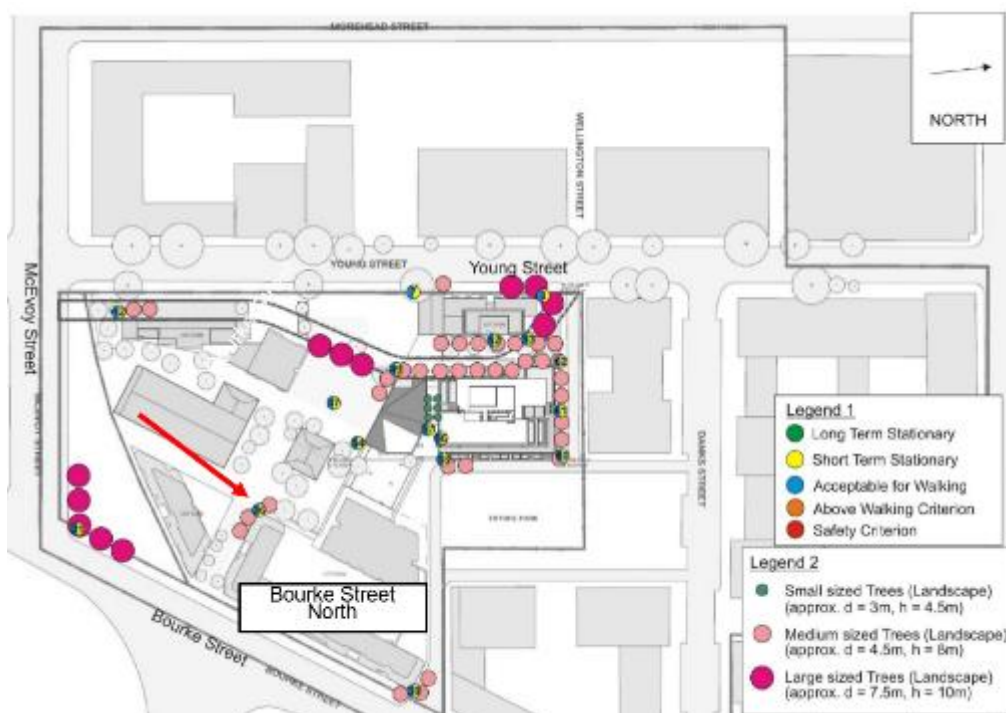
Test Location 36, which is at the south-western corner of the Bourke Street North Building (red arrow), is likely to be above the walking comfort criterion for the certain westerly wind directions. This area (west of the Bourke Street North Building) is shown as being likely to contain chairs and tables associated with future food and drink premises.
